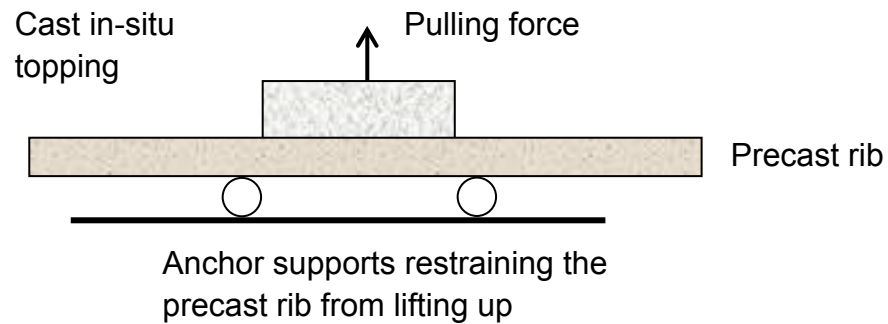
Pulling of cast in-situ structural topping (or beam)
